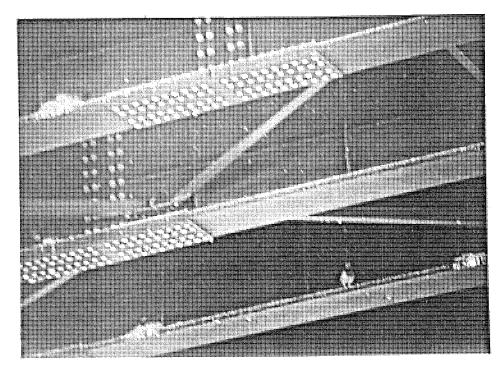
Bird nests on beam flanges of a high level unpainted A588 bridge.
